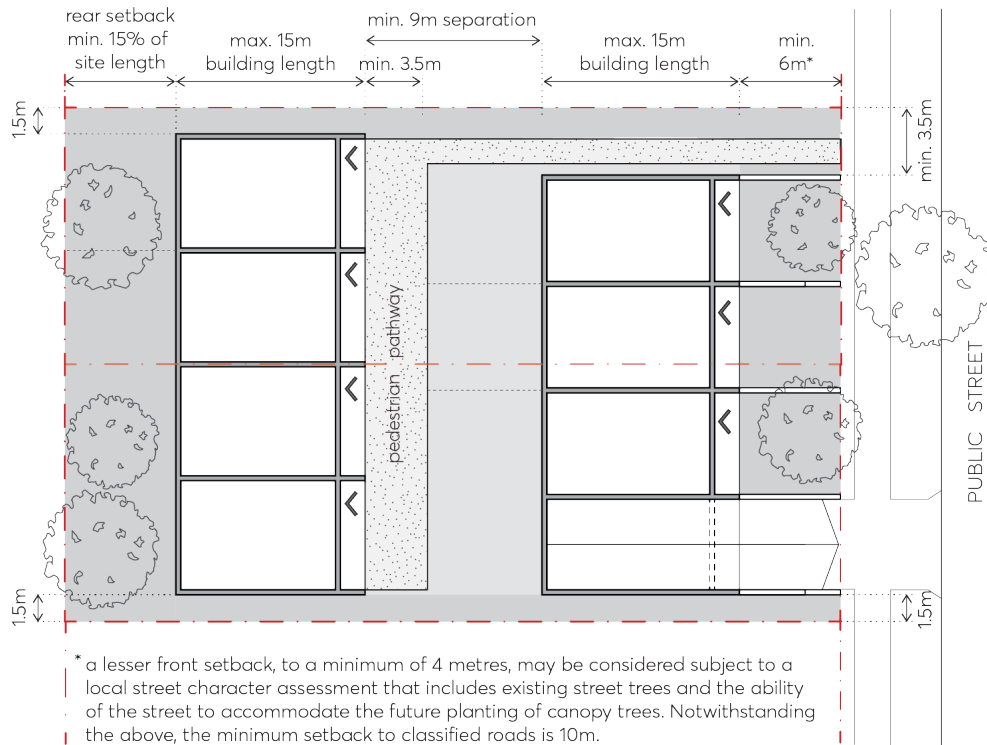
Two Rows of Townhouses Setbacks and Separation
